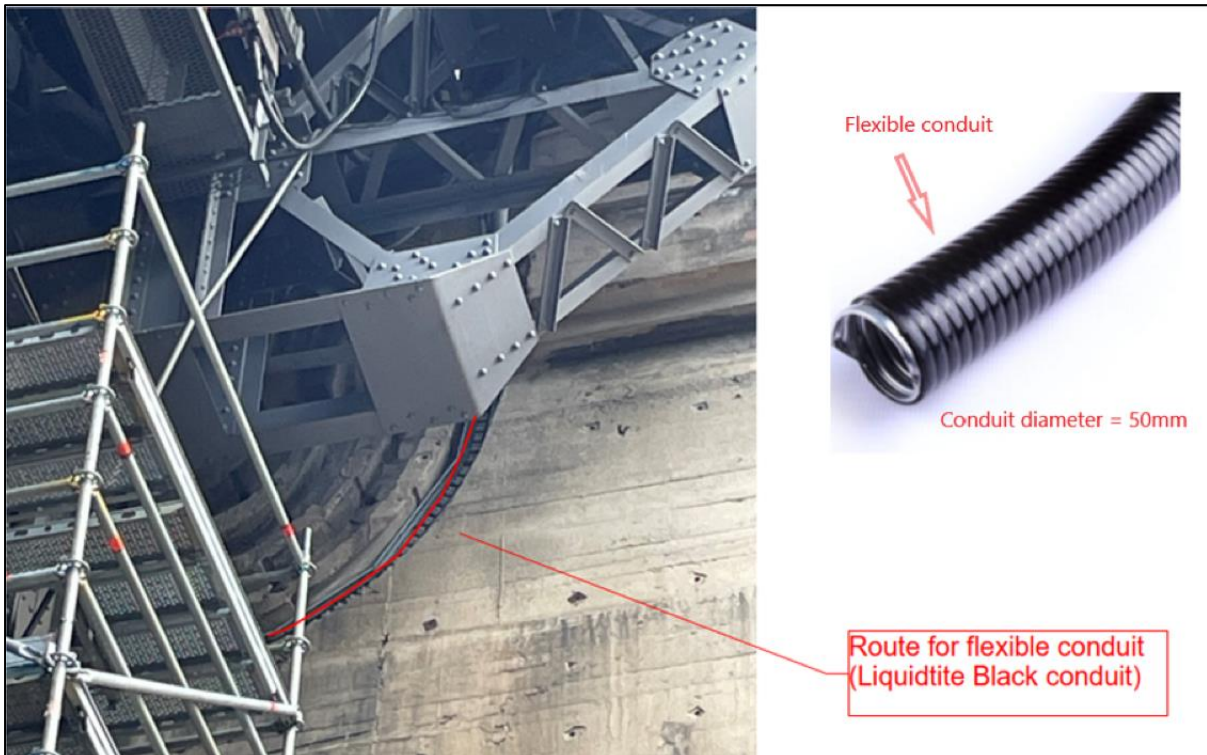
Conduit installation route in existing channels of the Sydney Harbour Bridge
